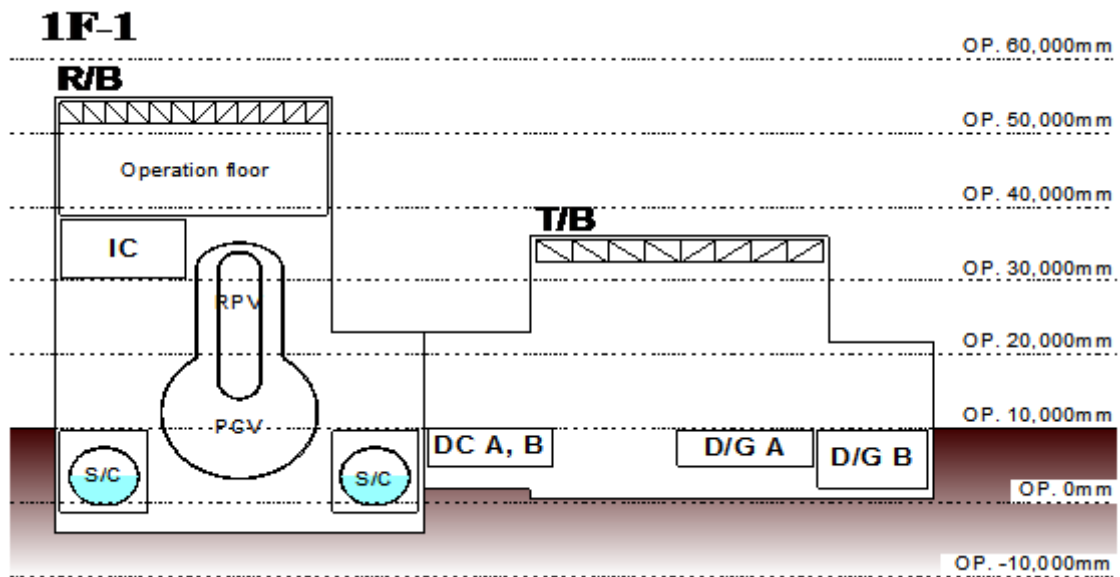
Building Cross-section for Unit 1, Fukushima Dai-ichi NPS
